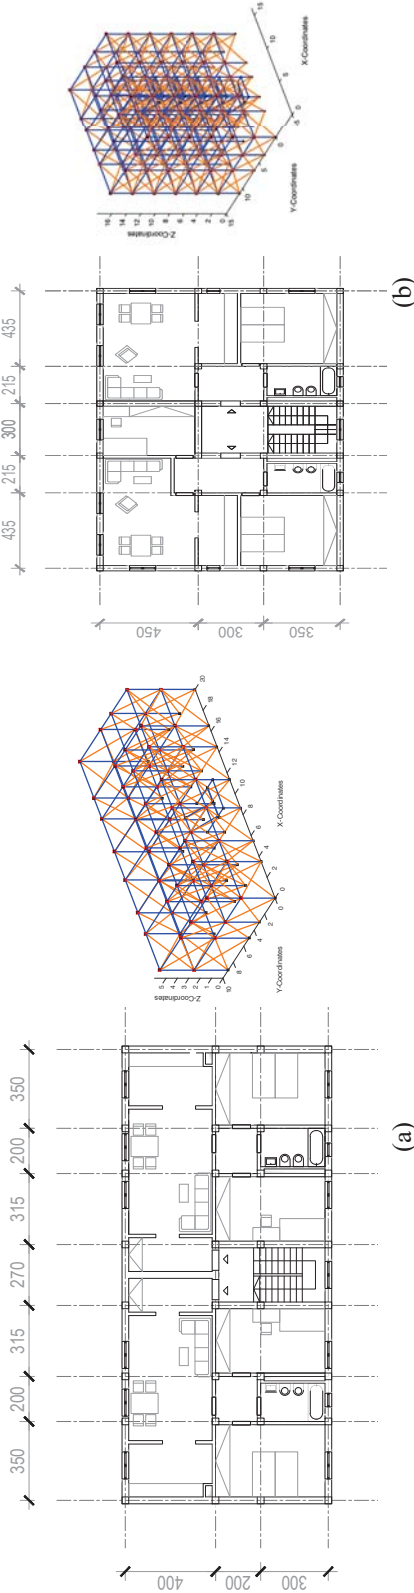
Architectural plan layout and OpenSees numerical model of (a): 2-storey and (b): 6-storey infilled RC archetype buildings.
